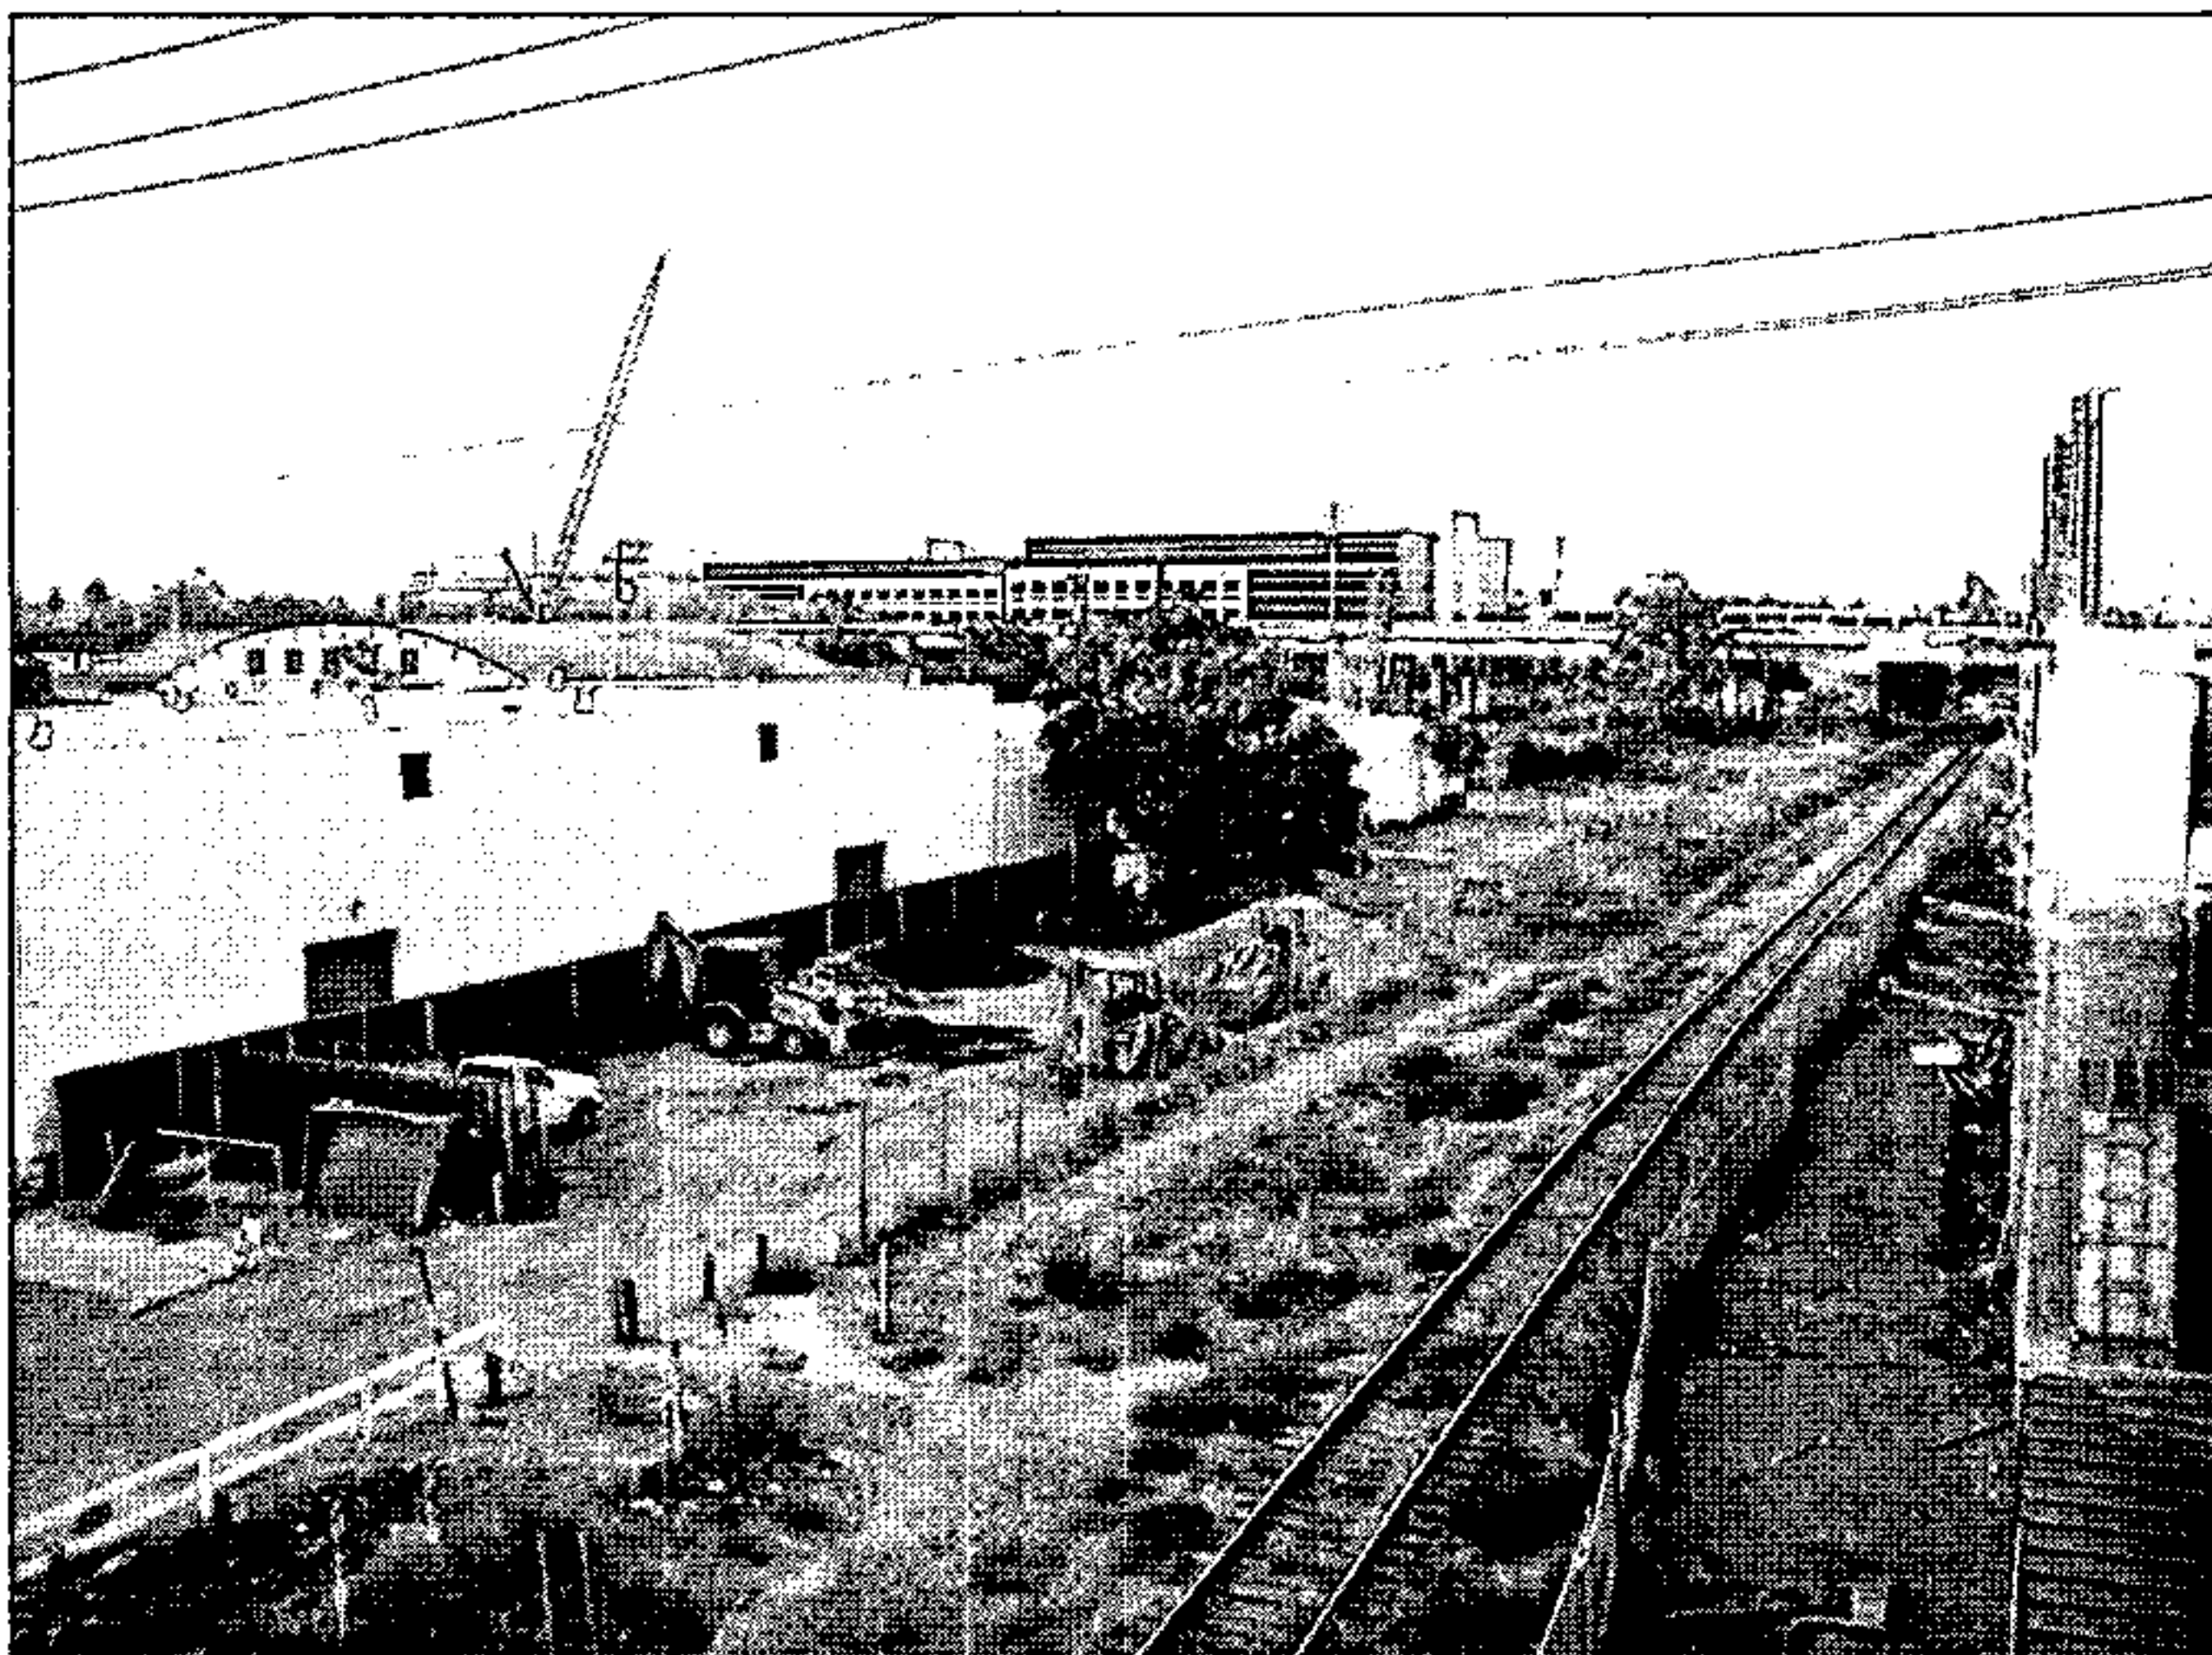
View of Northern Edge of Project Site, Looking Southwest from Market Street/Coleman Avenue Overpass.
